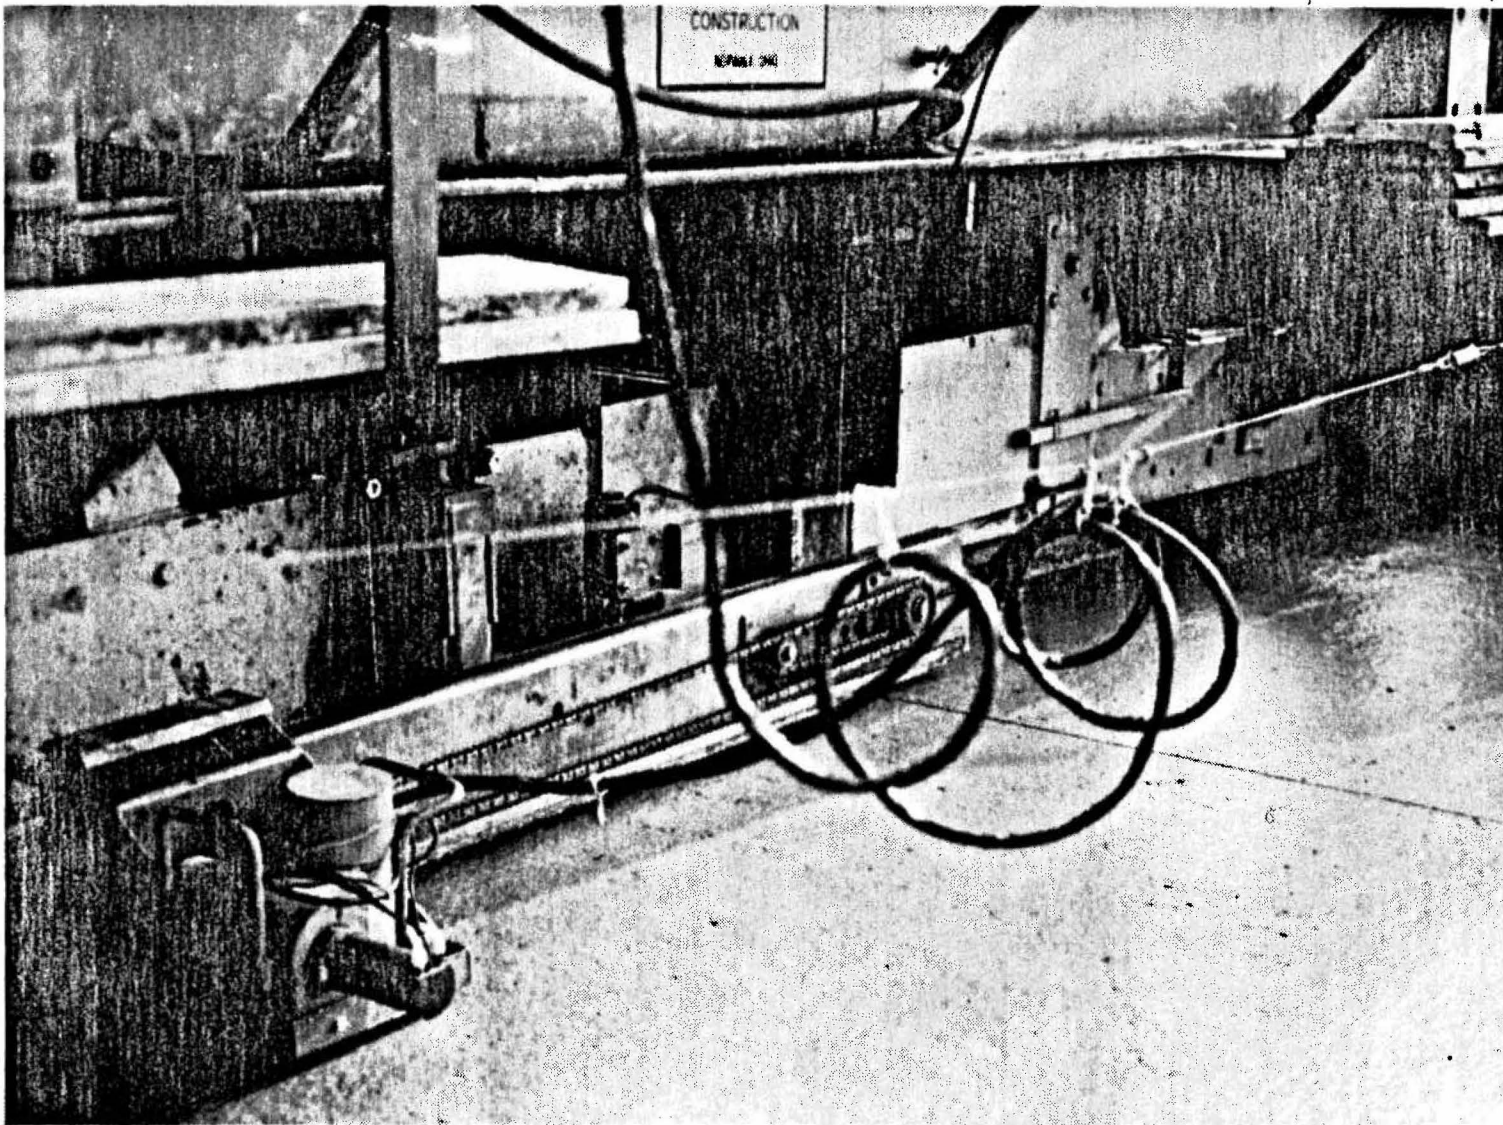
Traversing mechanism mounted to paver - note mounting brackets welded to longer channels, and part of center supporting beam cut away.
